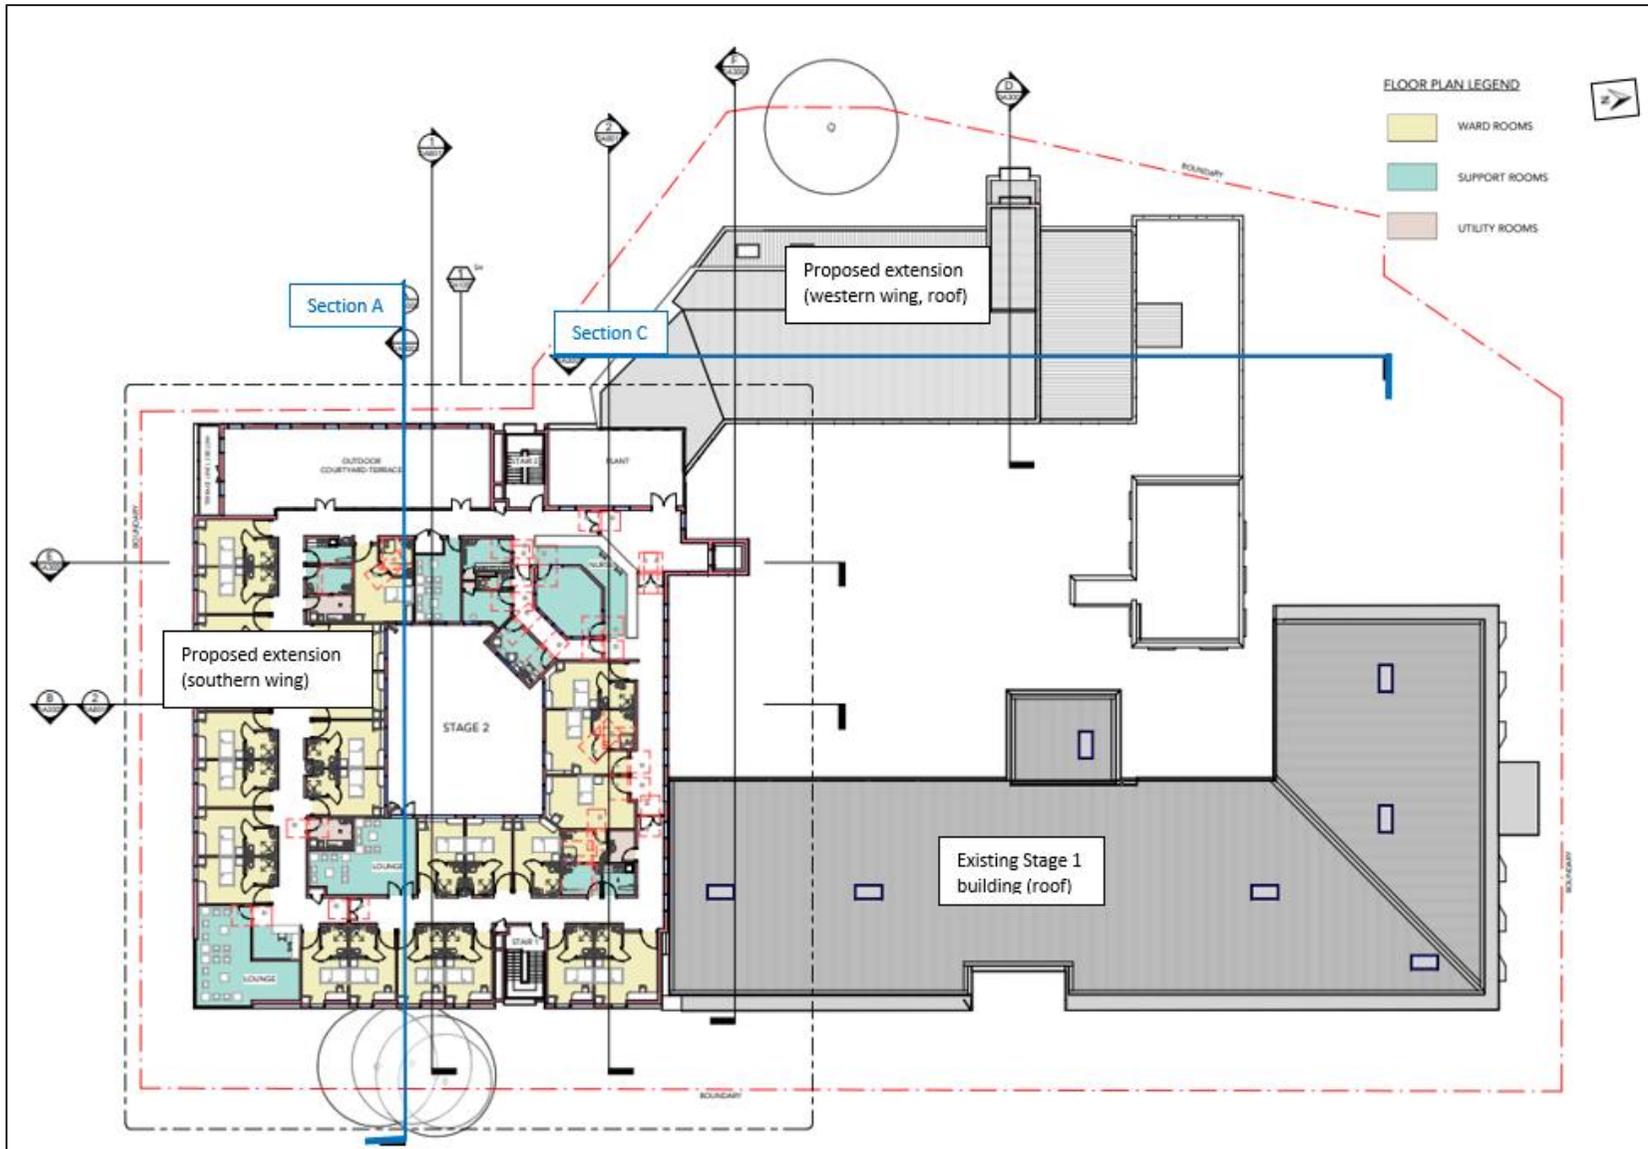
| Proposed second floor level (Source: Applicant's SRtS)
